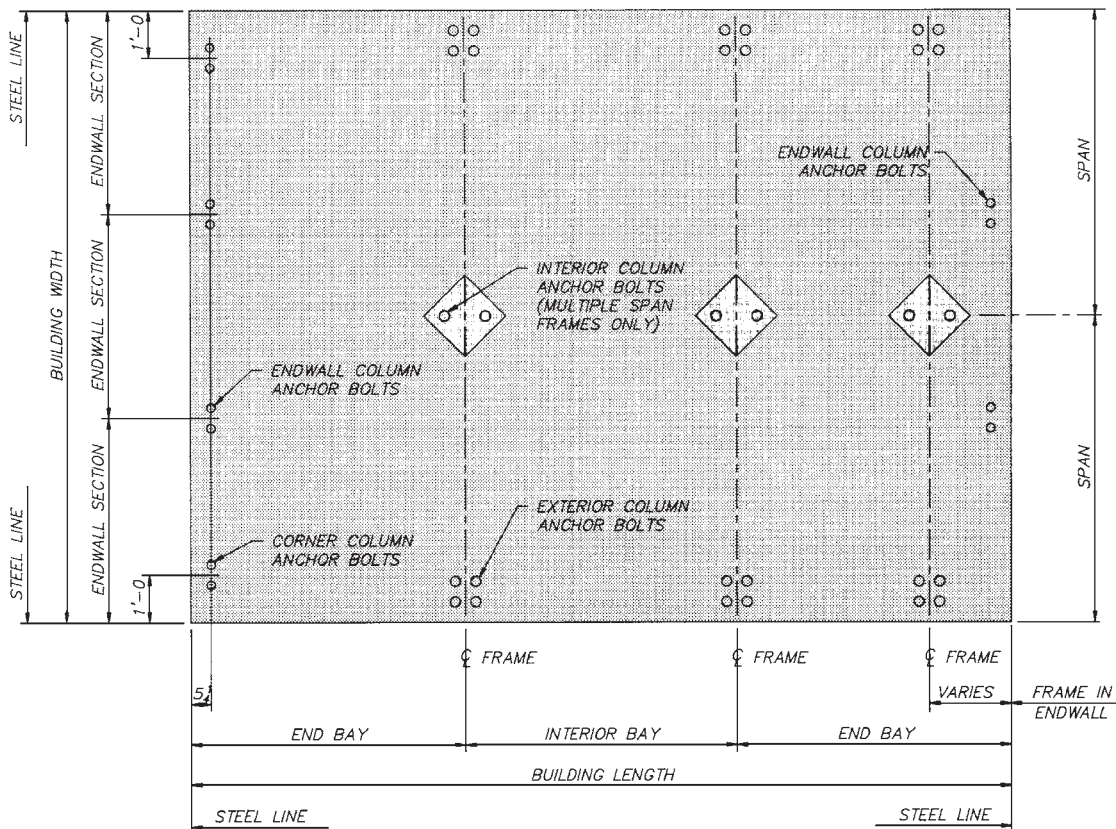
Typical anchor bolt layout. (Note that recently enacted OSHA Standards for Steel Erection require a minimum of four anchor bolts for all columns, except for “posts” as defined in Sec. 12.6.1.) (*Star Building Systems.*)
